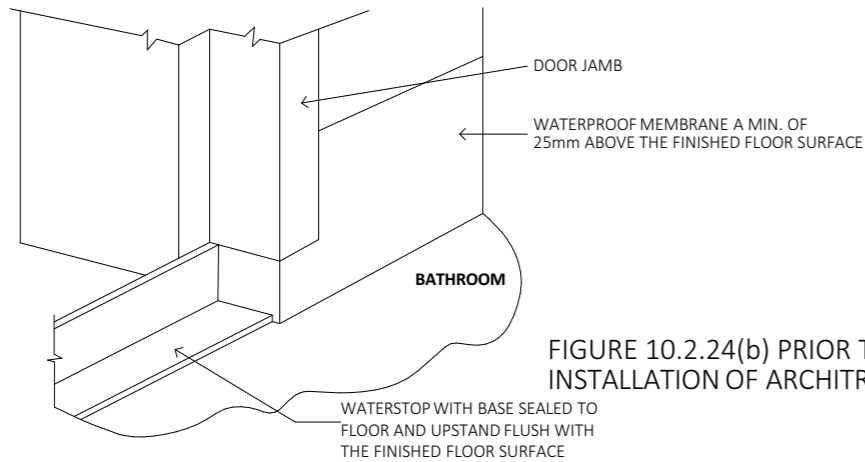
(b) PRIOR TO INSTALLATION OF ARCHITRAVE
